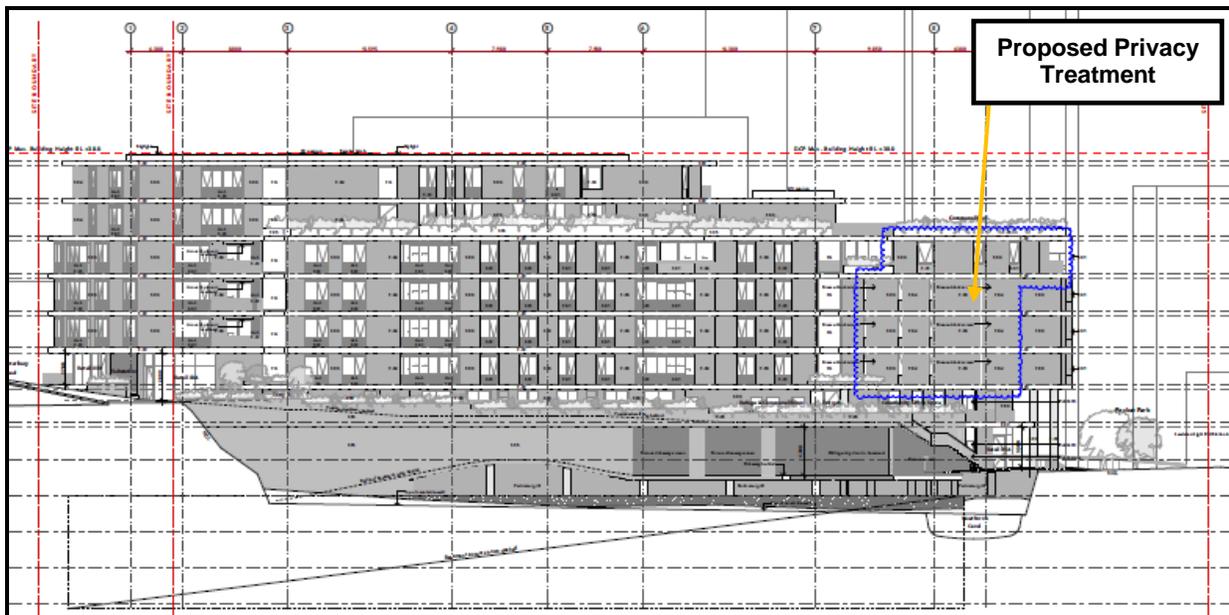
Excerpt East Elevation illustrating amended privacy treatment to units in proximity to No. 14 McGill Street
